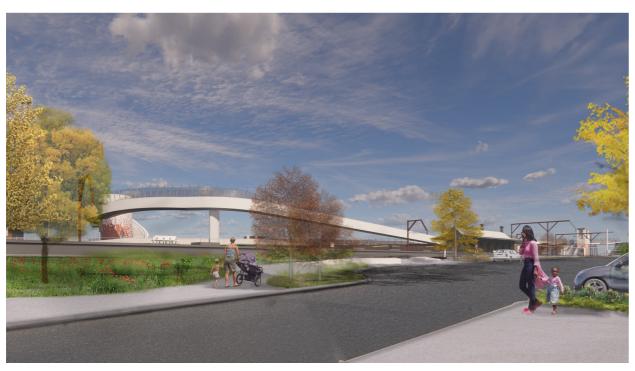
Option 3 - View of Half Bridge looking north towards station from Railway Parade.
